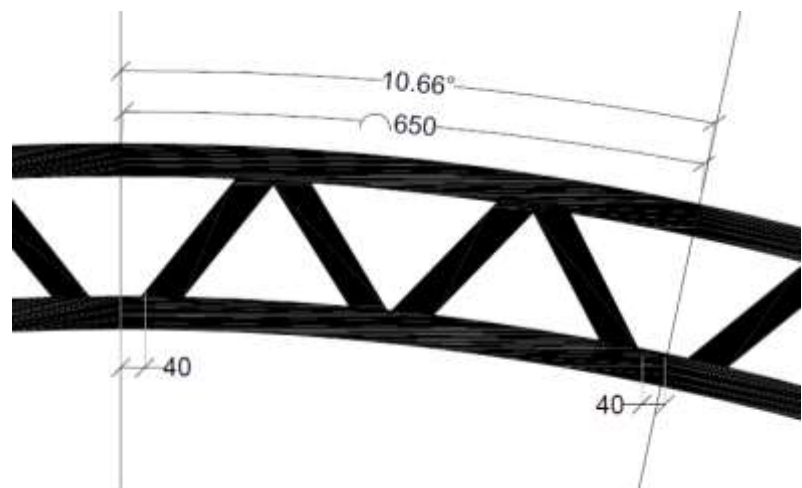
Close-up of one extruded part in a horizontal cross-section at the bottom of part D
